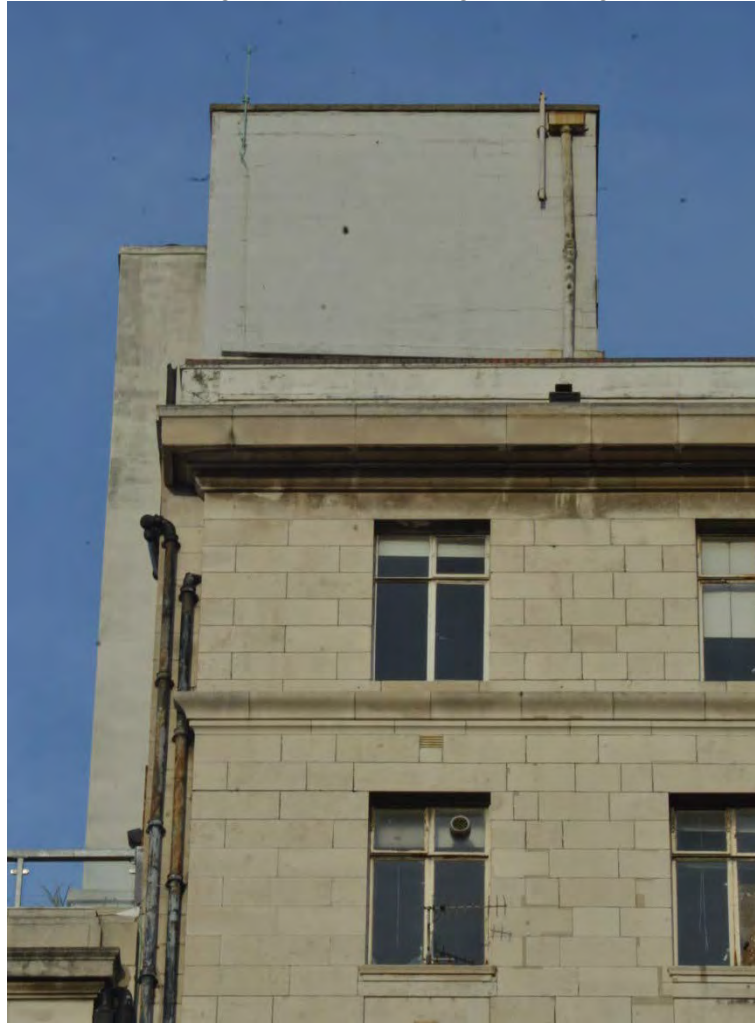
Detail of upper floor windows and mouldings and lift plant room
